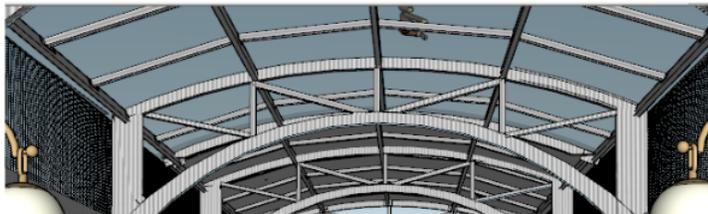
Hook and Cantilevered Beam Attachment for Nylon Nets.
